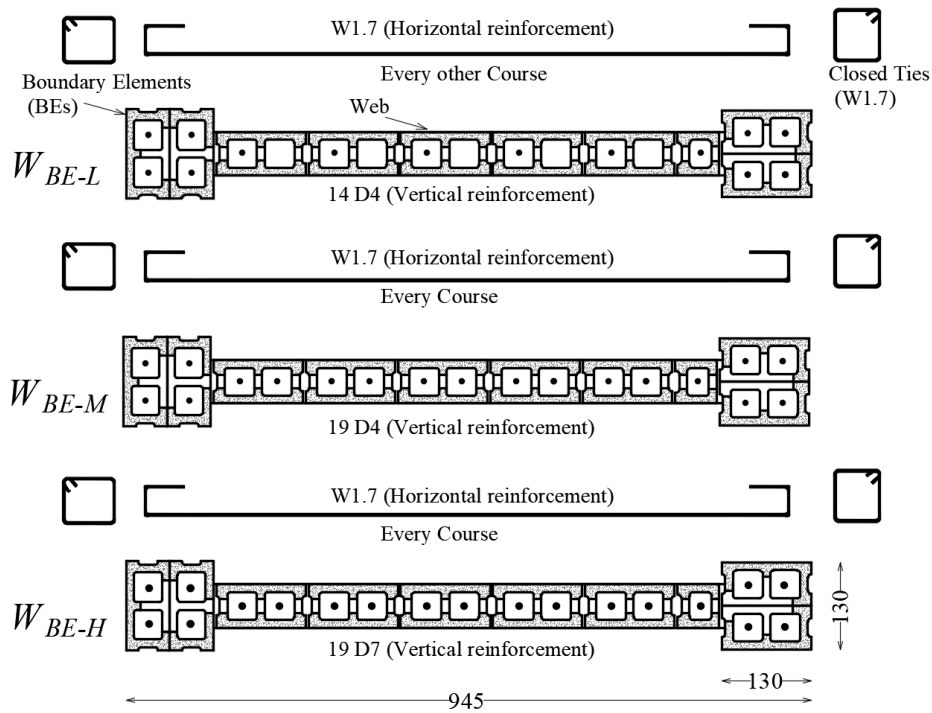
Cross-section of the tested walls (all dimensions are in mm)
